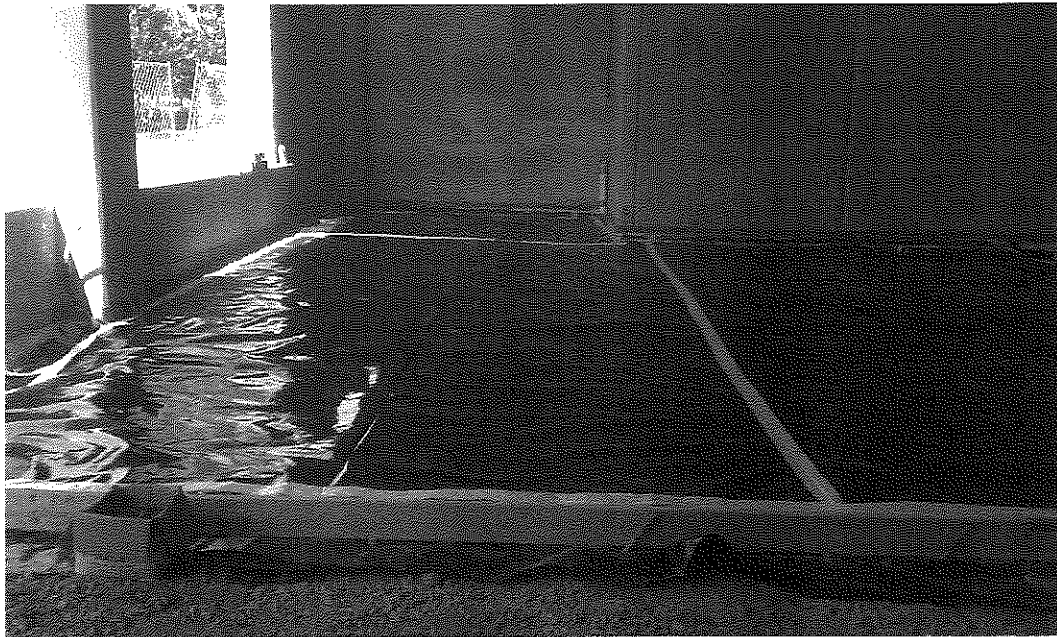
15-mil vapor barrier in process of being installed at west end in south half of building with taped seams and perimeter; west exhaust point stub in background (view to west; July 1, 2014).
